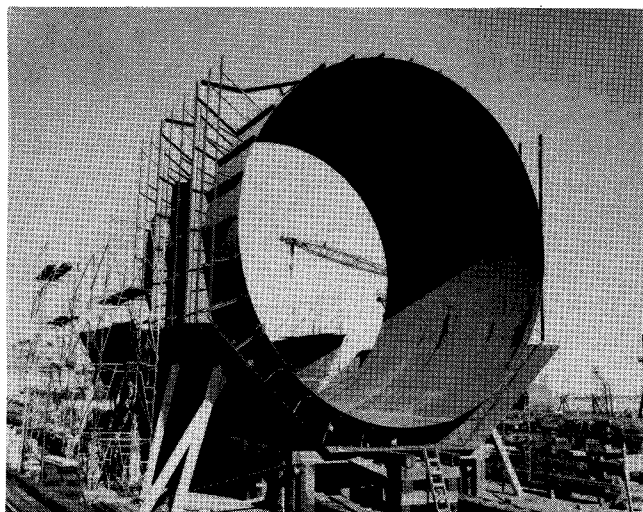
Fabrication of a tunnel section at the American Bridge Division of United States Steel Corporation, Orange, Texas
